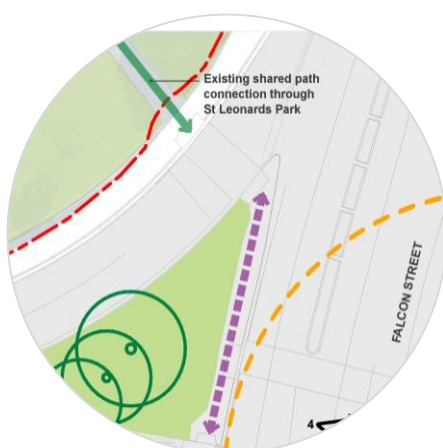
Extract from a plan in Chapter 5 of the PDLP showing connections near the replacement Falcon Street active transport bridge. The existing path up to St Leonards Park is marked DDA-compliant which is not correct. This plan does not align with the graphic in Figure 3. (Source: TfNSW/CPBD)
